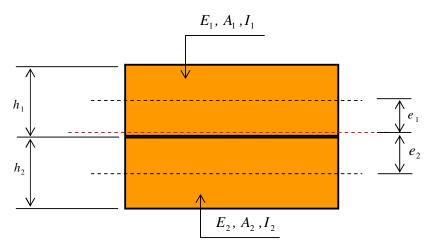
Cross-section of a two-layer beam with wood dowel connection
